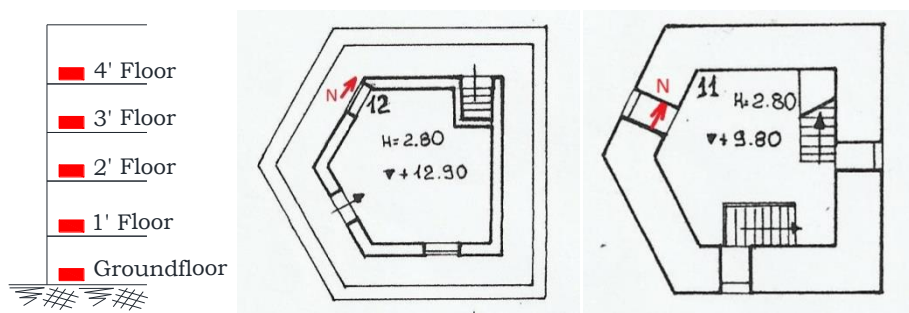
Measurements position in elevation in 'Cesta' Tower
